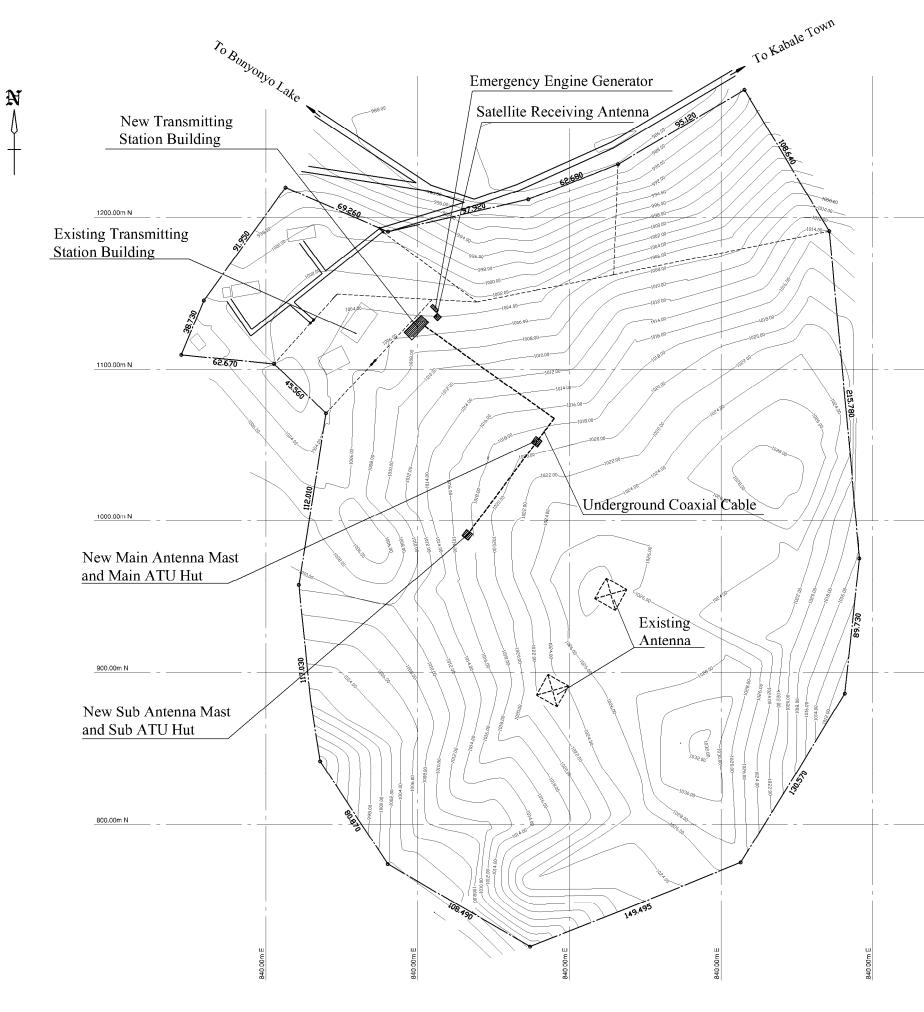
Kyeriba MW Transmitting Statin / Site Layout PlanS=1/2500
